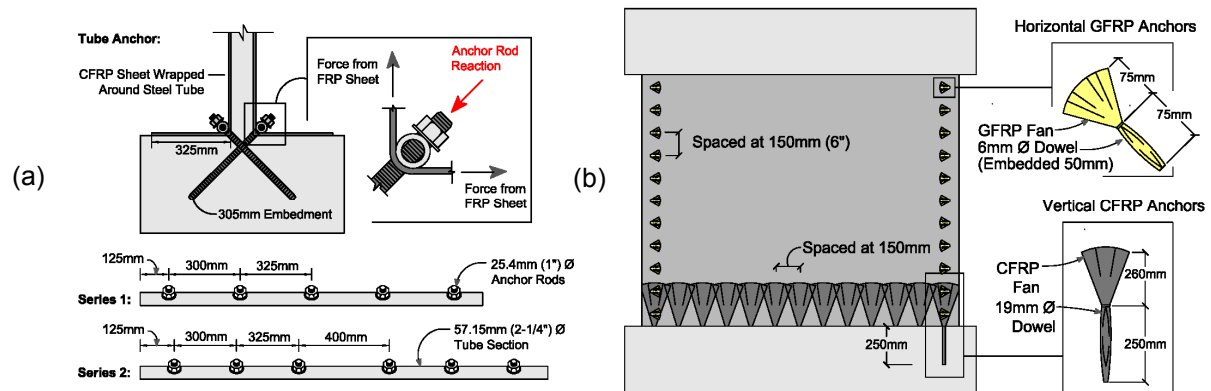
(a) Tube anchor system design details; (b) CFRP/GFRP fan anchor system layout.
